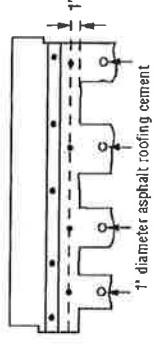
Fastening Presidential and Presidential TL Shingles on steep slopes.
